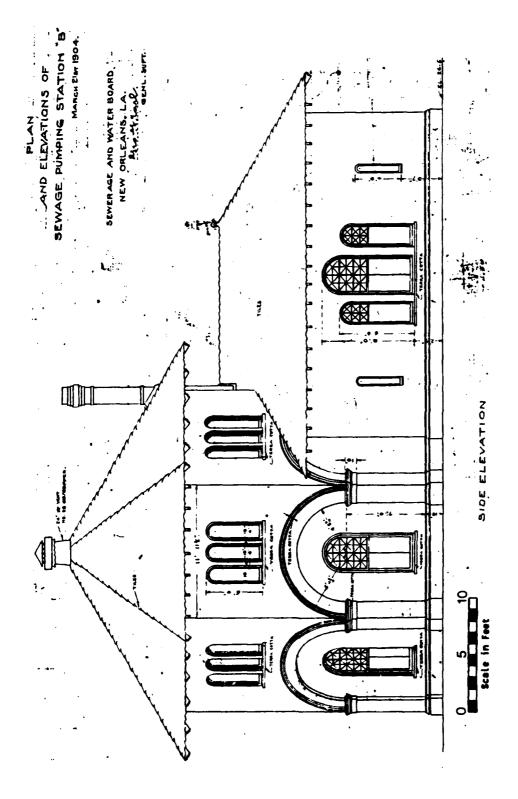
A 1904 drawing of the side elevation of Station B (reproduced from Drawing No. 1031-A-10, Sewerage and Water Board files).
